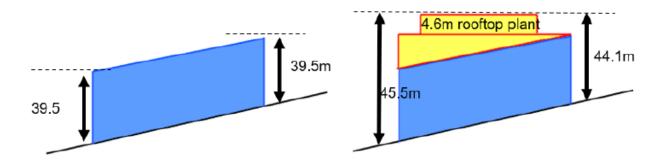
Building heights – showing the majority of the additional built form will be located away from the Canterbury Road frontage
